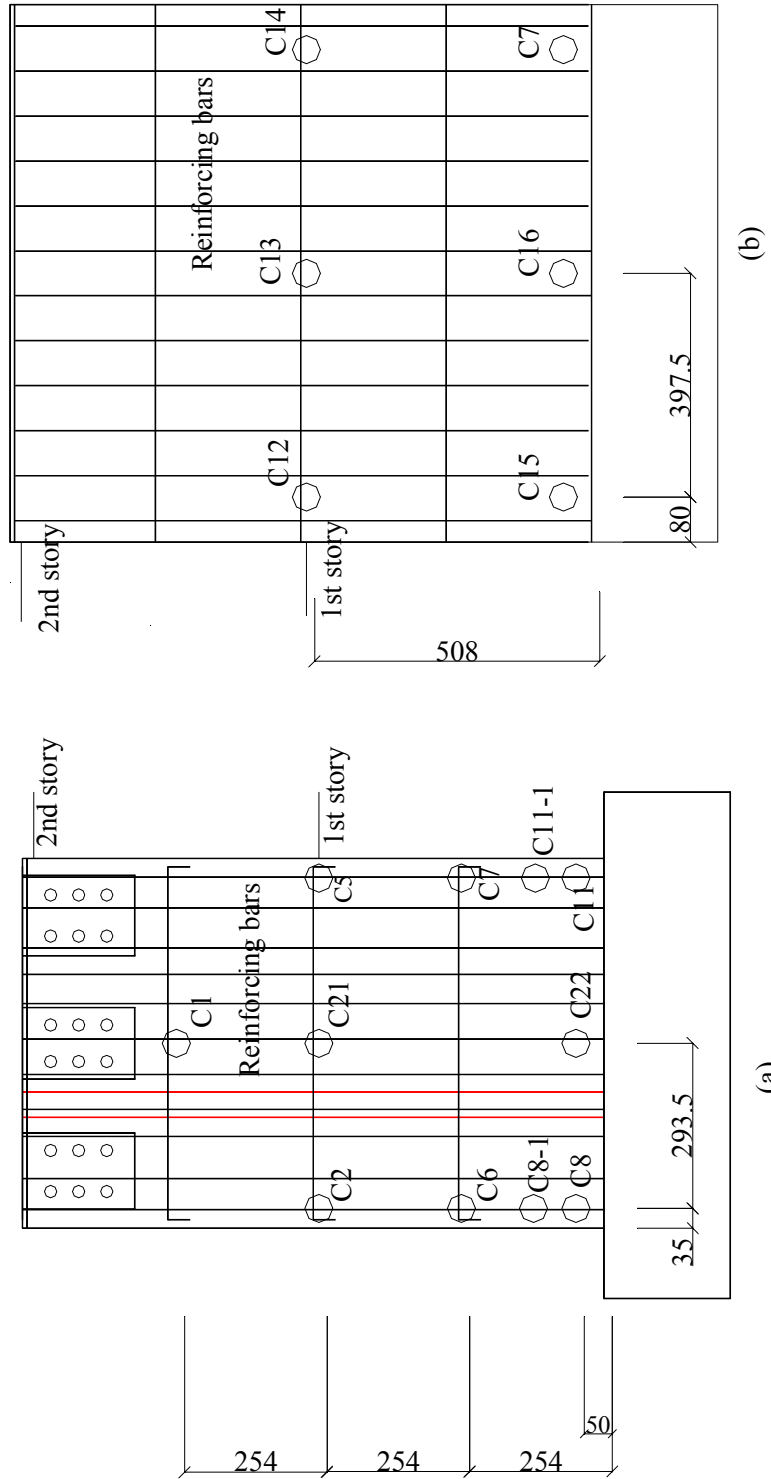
Locations of strain gauges on the reinforcing bars (a) left flange wall (b) web wall
